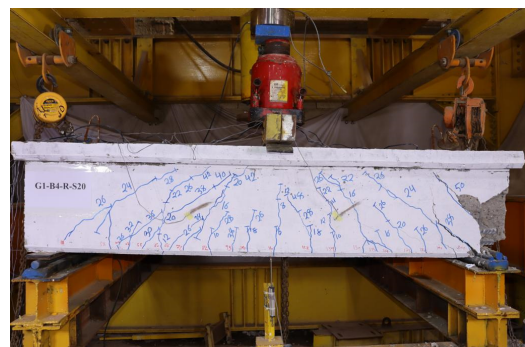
Failure crack pattern of specimen G1-B4-R-S20.
